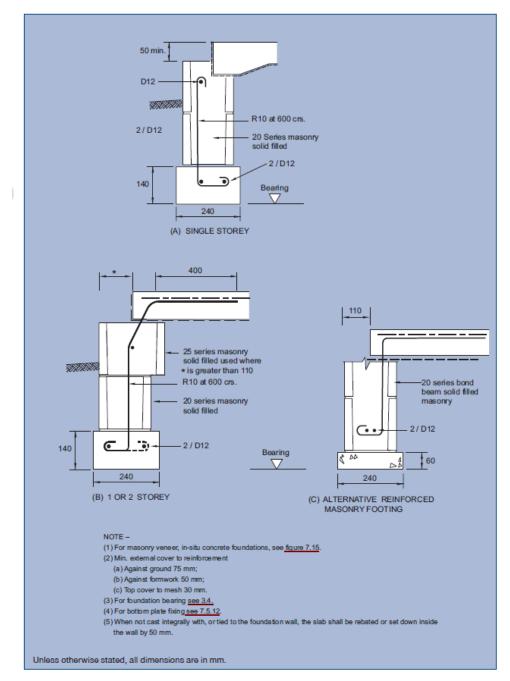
Masonry veneer foundation edge details – Concrete masonry
